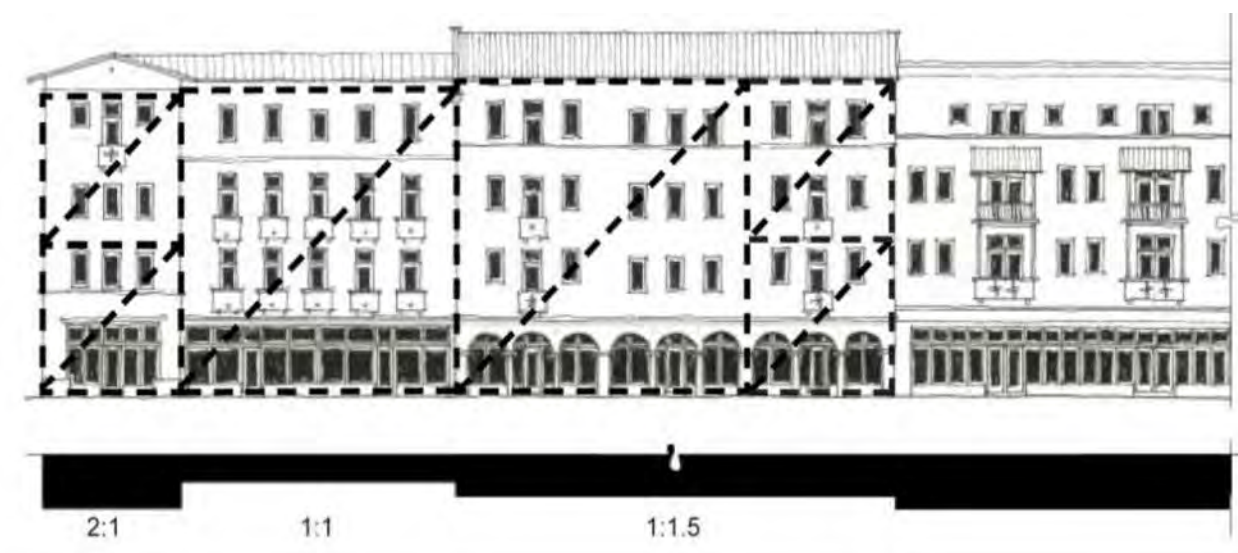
FACADE ARTICULATION PROPORTIONS
